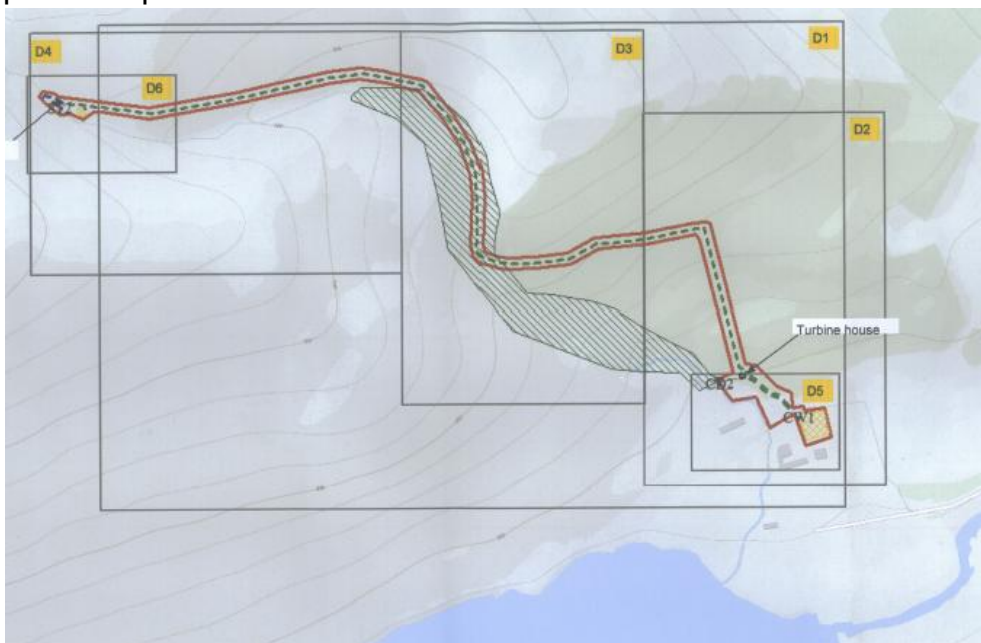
Extent of Hydro Scheme (Extract from Drawing No I2019D002-06 1 of 9 Location Plan – for information only).
